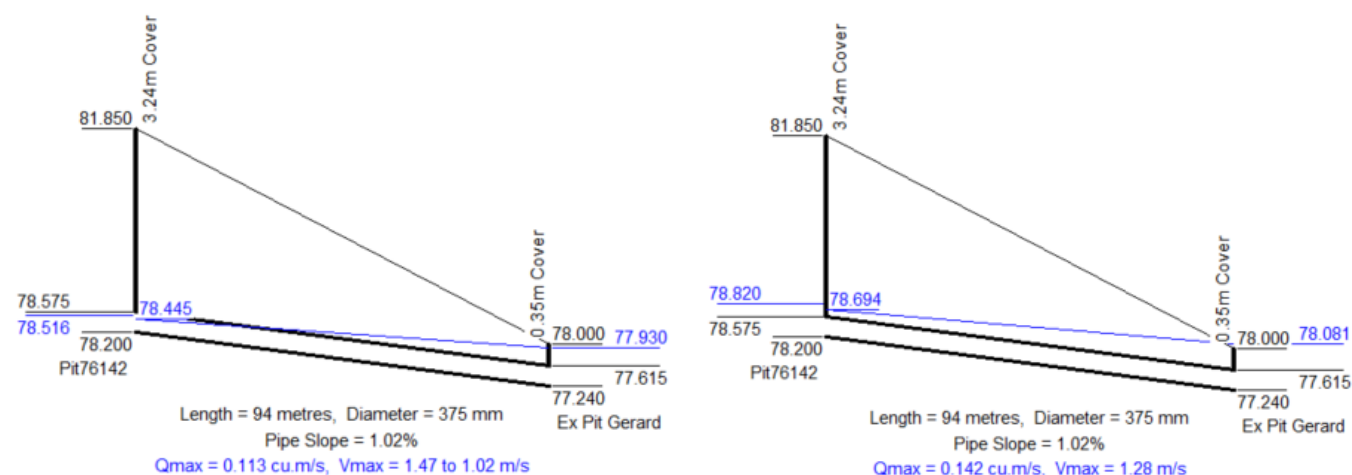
Gerard Street drainage extension longitudinal section – 10% AEP and 1% AEP
